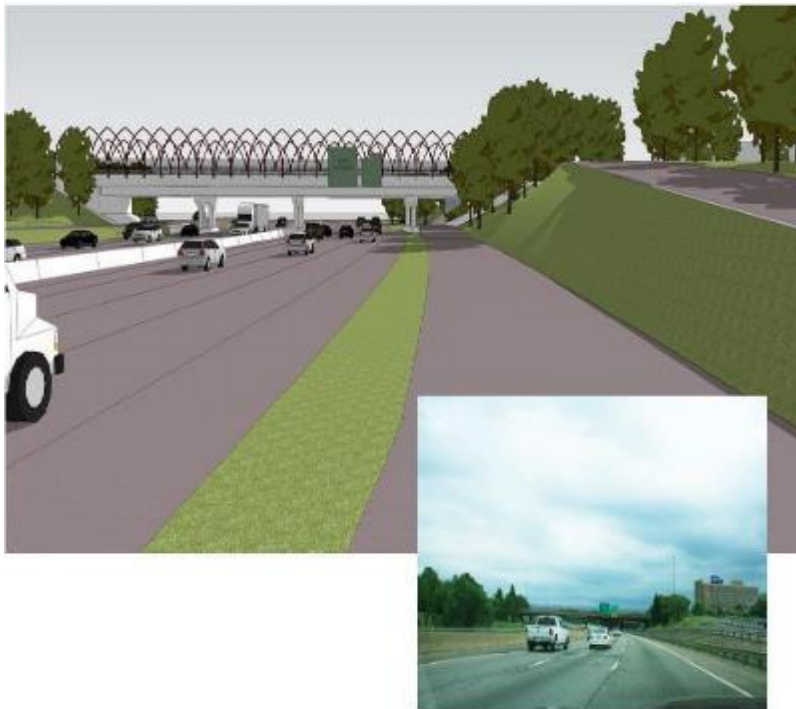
Exit 52 Washington Street coming into the City (artist rendering and photographs)
